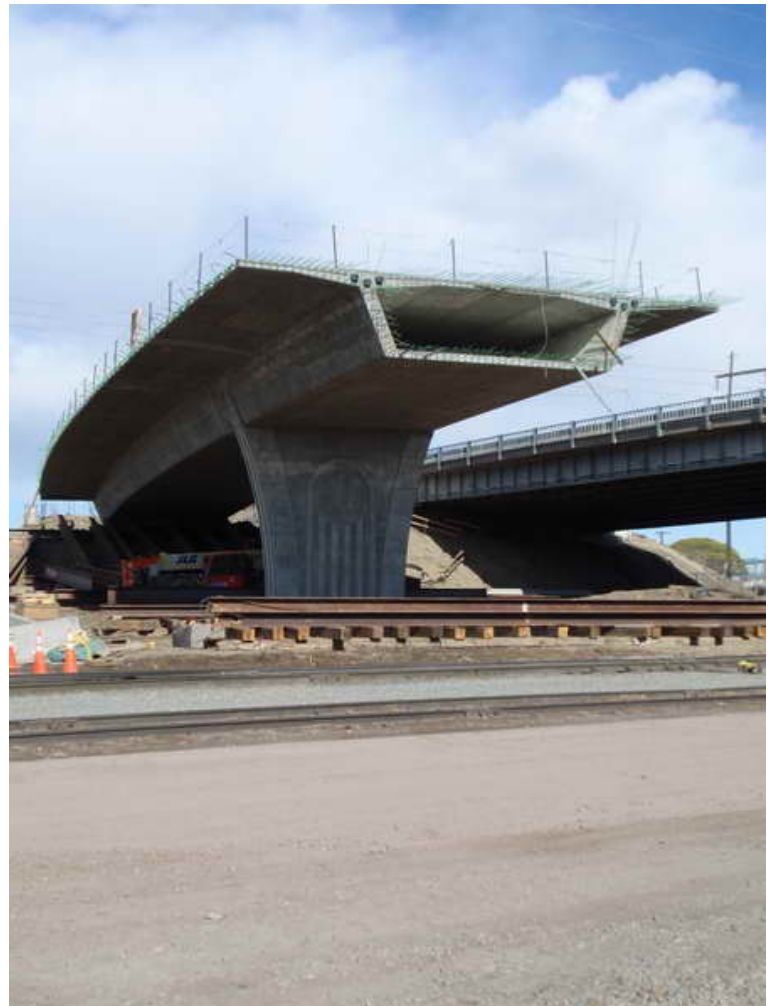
Cantilever 3 WB Superstructure Construction – April 1, 2009:
